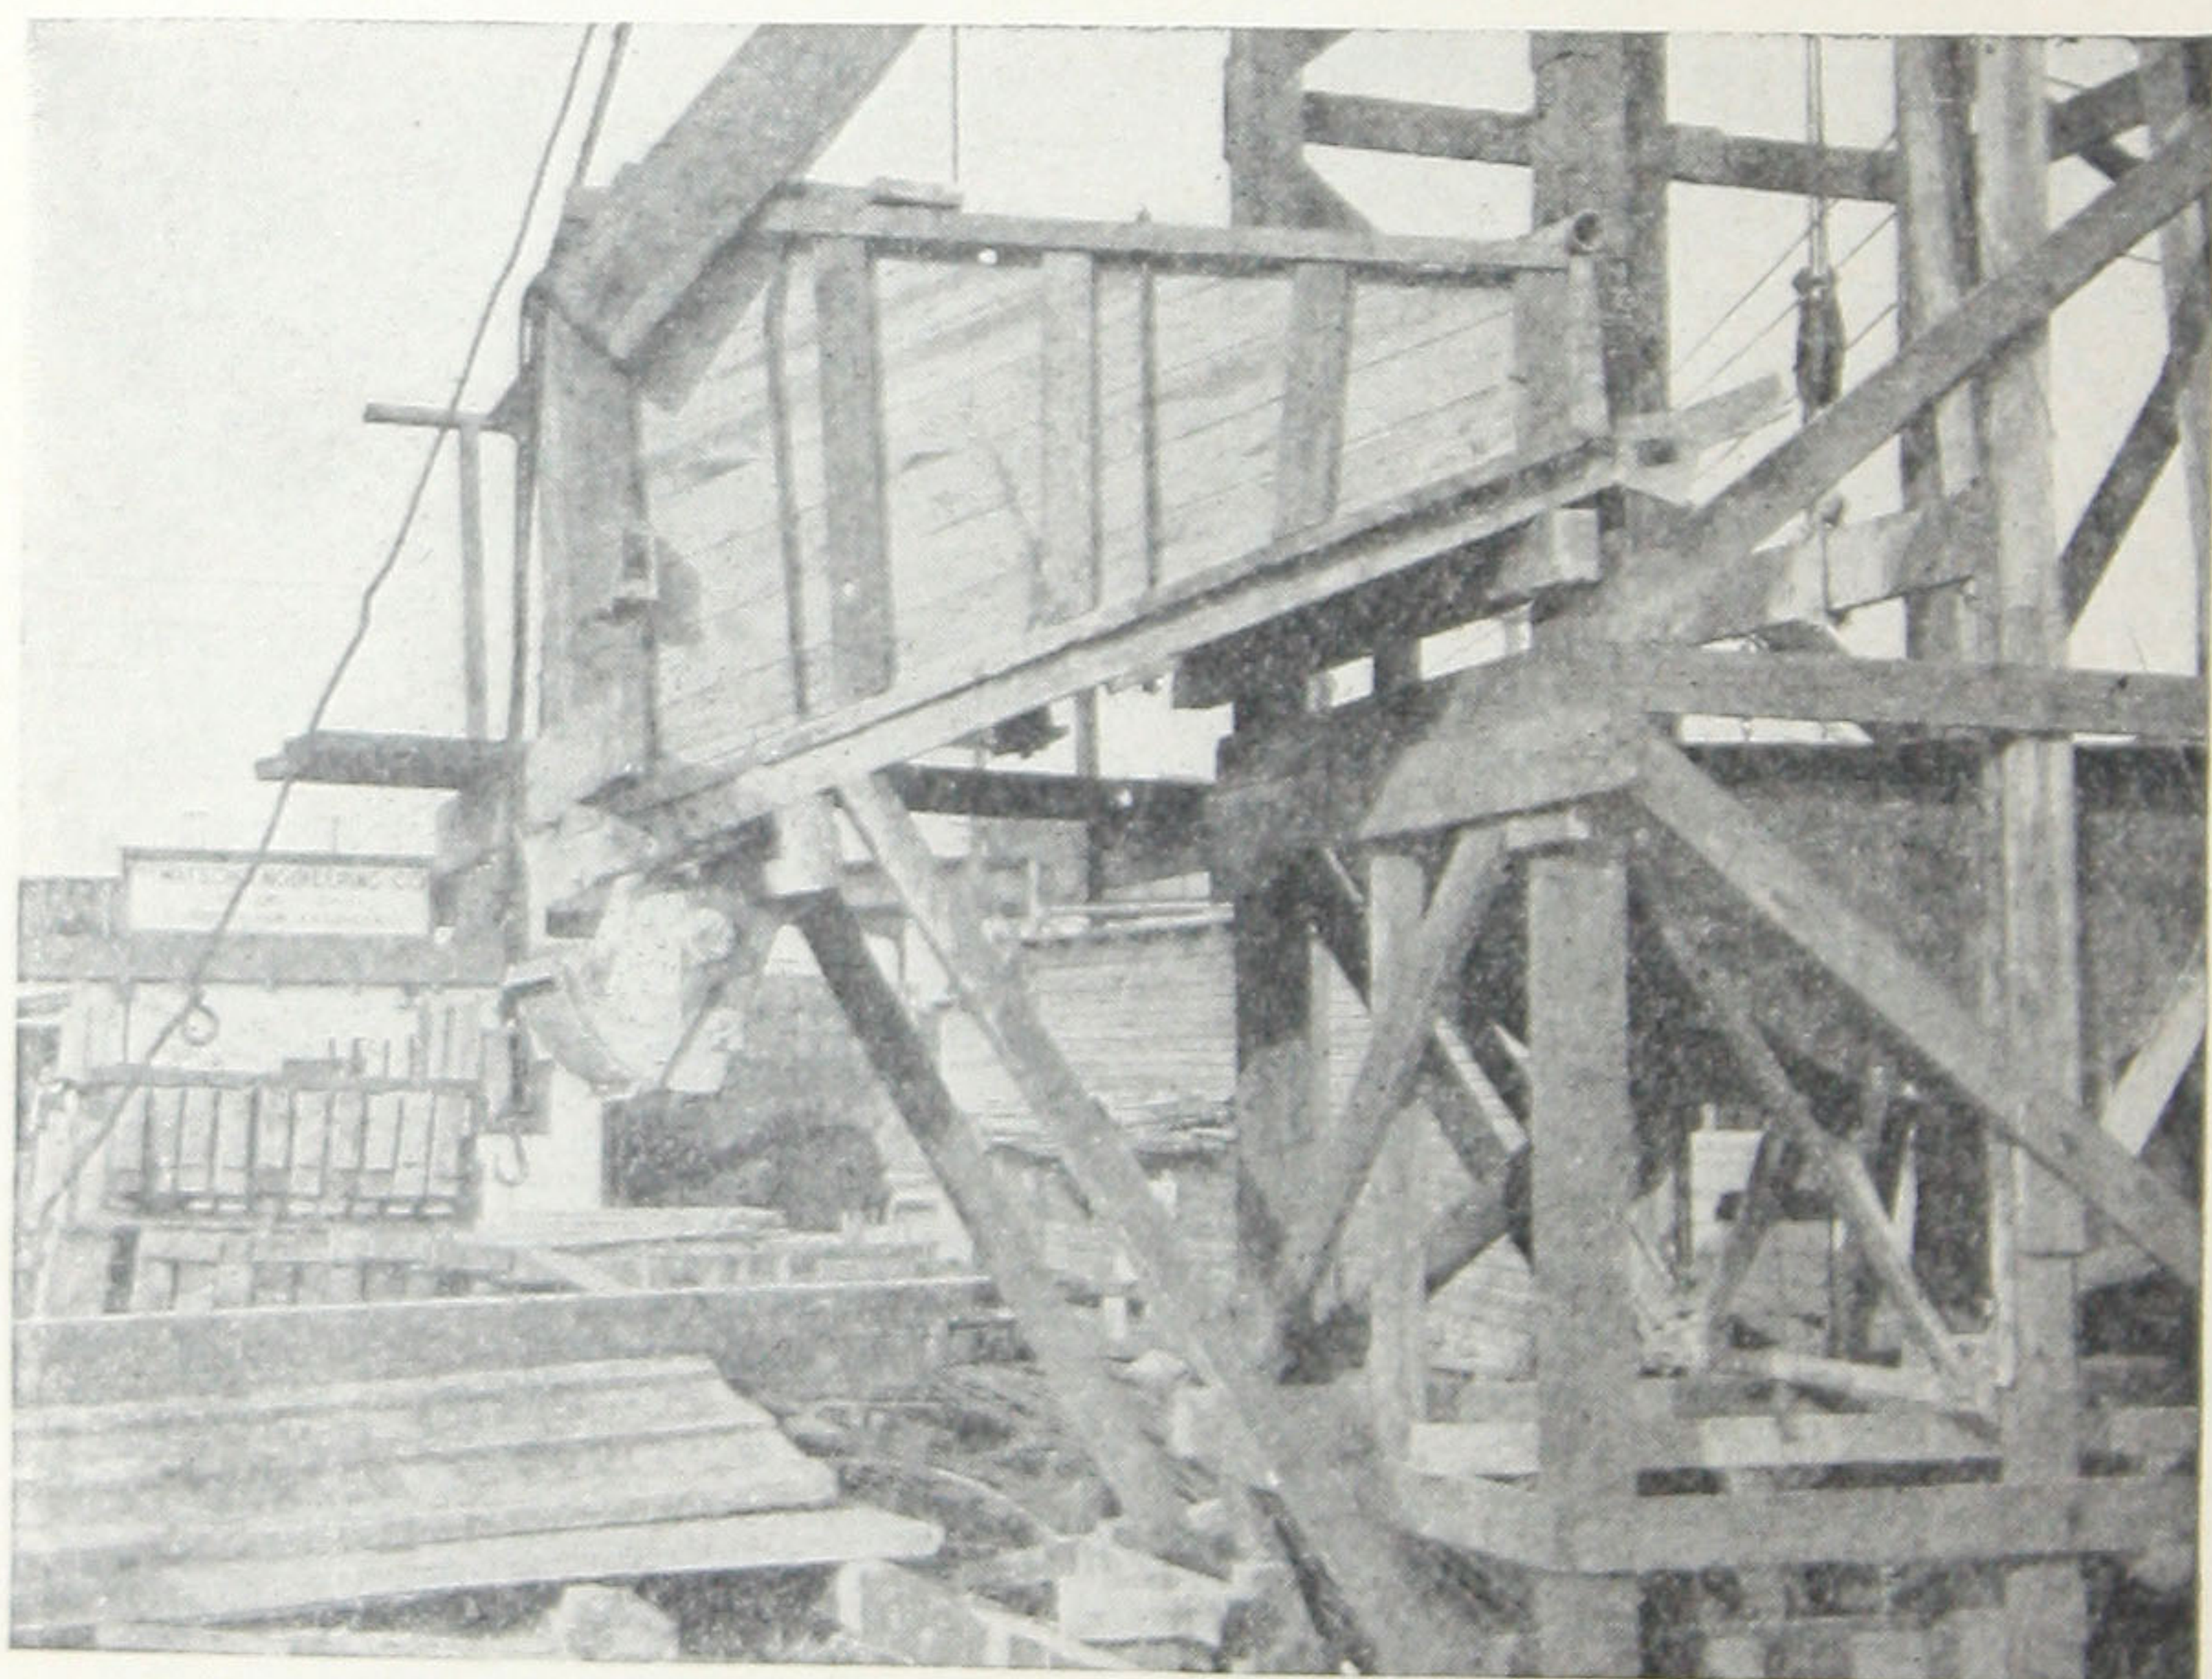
Wood hopper made on the job for use with the wood concreting tower shown in Figure 10. Usually a manufactured steel hopper is more convenient as well as much more durable.
